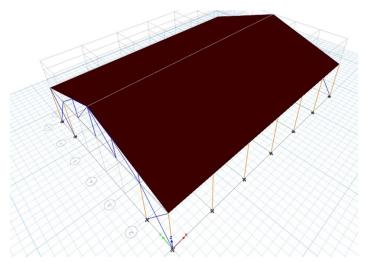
3-Dimensional model of Pre-Engineered Building having 27m span Pratt truss
